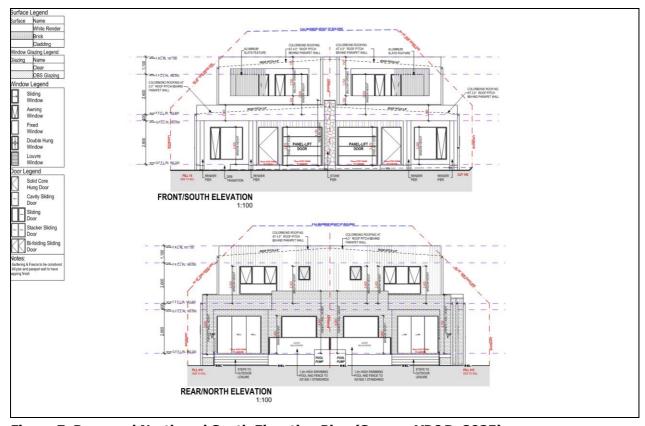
Proposed North and South Elevation Plan (Source: VD&D, 2025)
